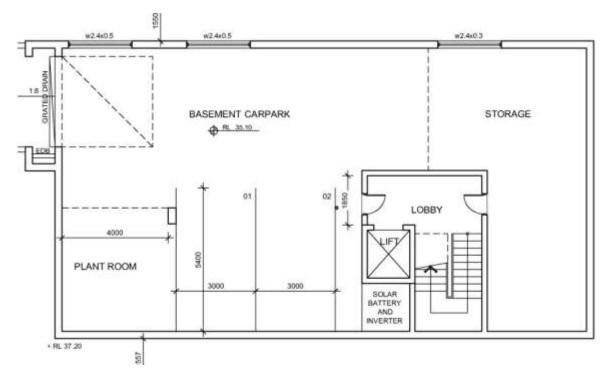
Extract of the initially proposed basement floor plan (source: N Lycenko Architect, received 24/08/2020)
